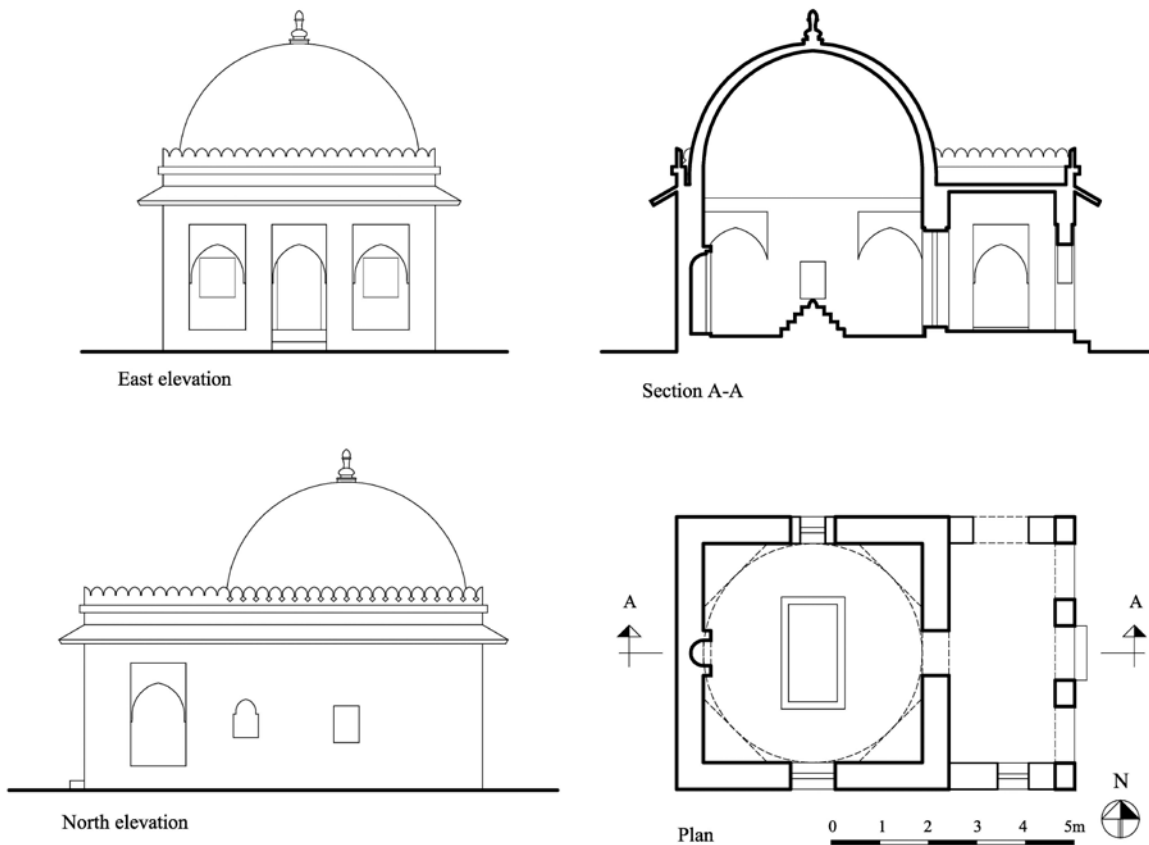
The shrine of Pir Ḥabash Bābā (39), plan, section and north and east elevations.
